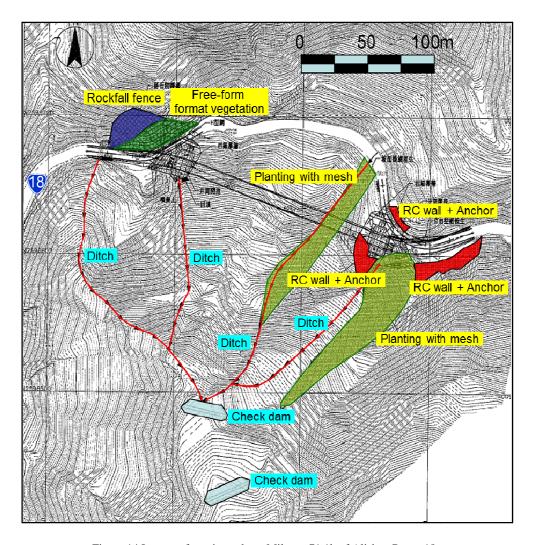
Layout of repair works at Mileage 71.1k of Alishan Route 18
